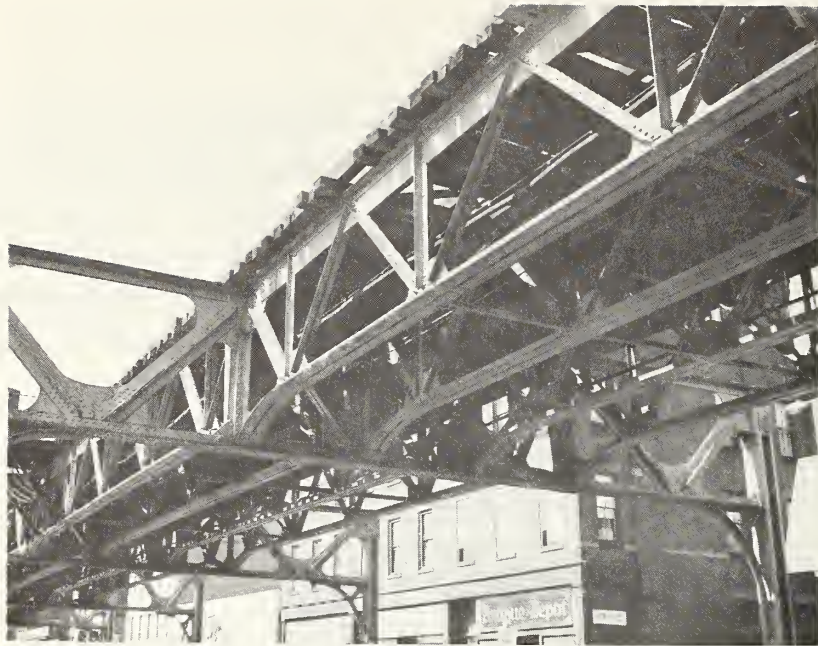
TYPICAL LATTICE OR OPEN-WEB GIRDER, OPEN TIE
